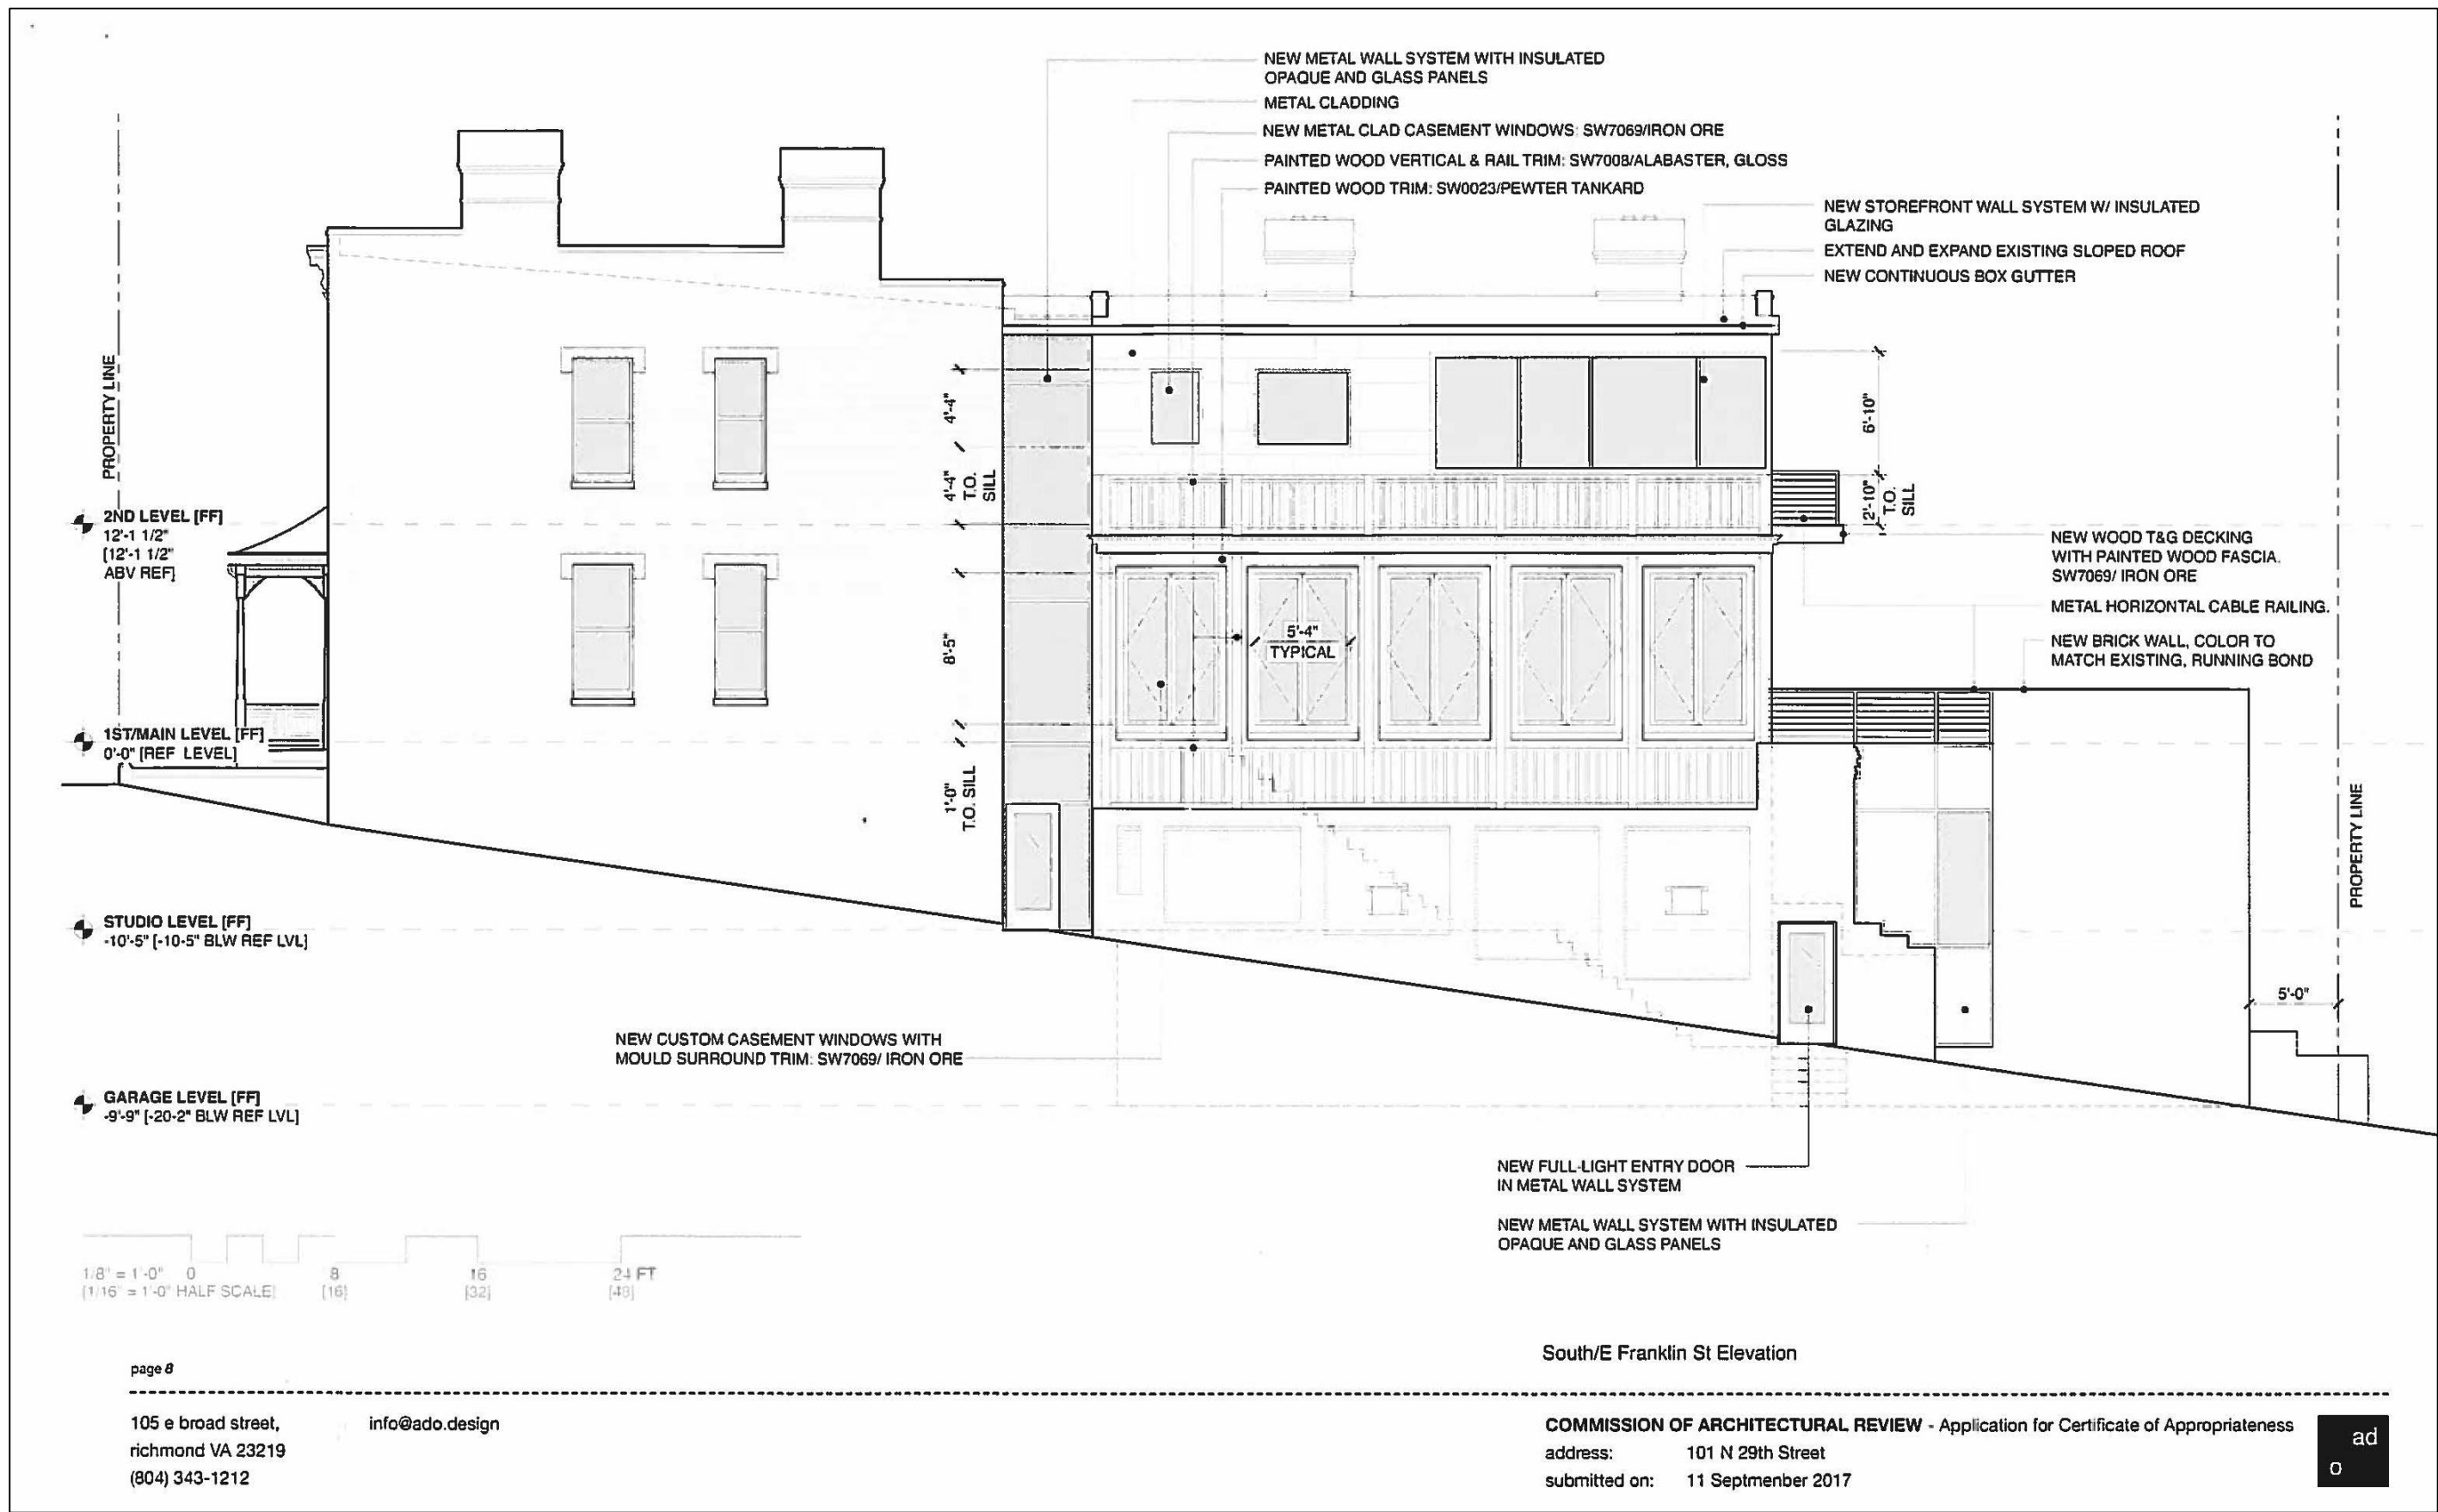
Previously approved elevation with faux railing on the second story, original connector between house and porch enclosure, and garage elevation. The rear elevation second story porch and the partial brick parapet wall on the garage were not approved.
